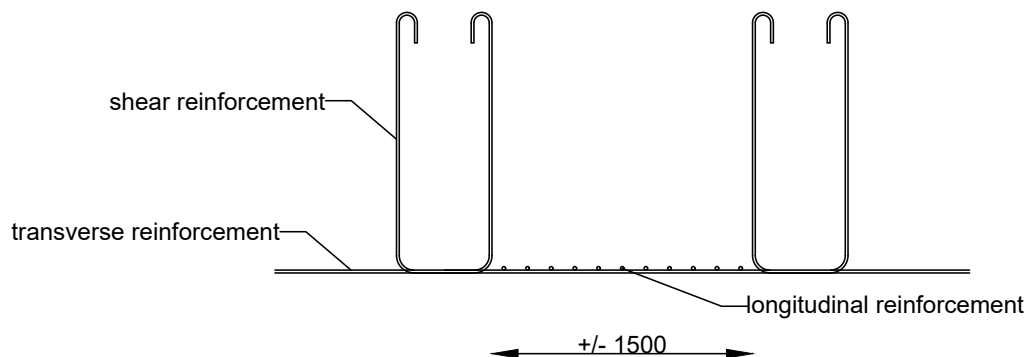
Longitudinal and transverse reinforcement bottom plate, Blankenburg case (mm)
